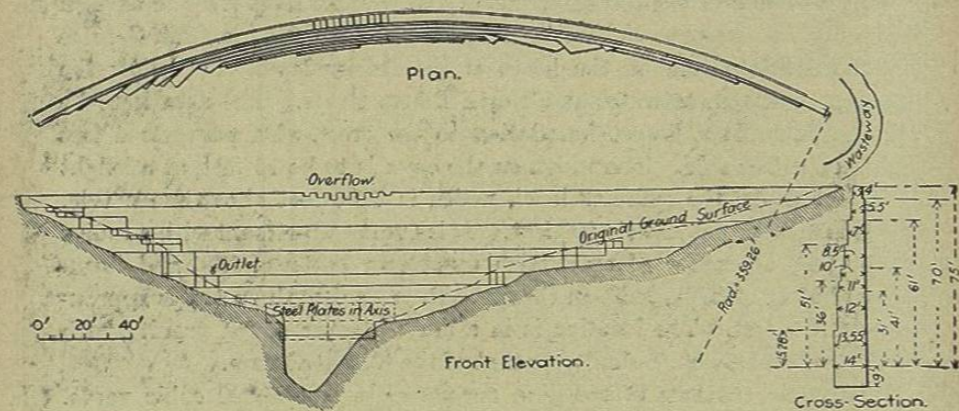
UPPER OTAY DAM, CALIFORNIA. PLAN, SECTION, AND ELEVATION.
